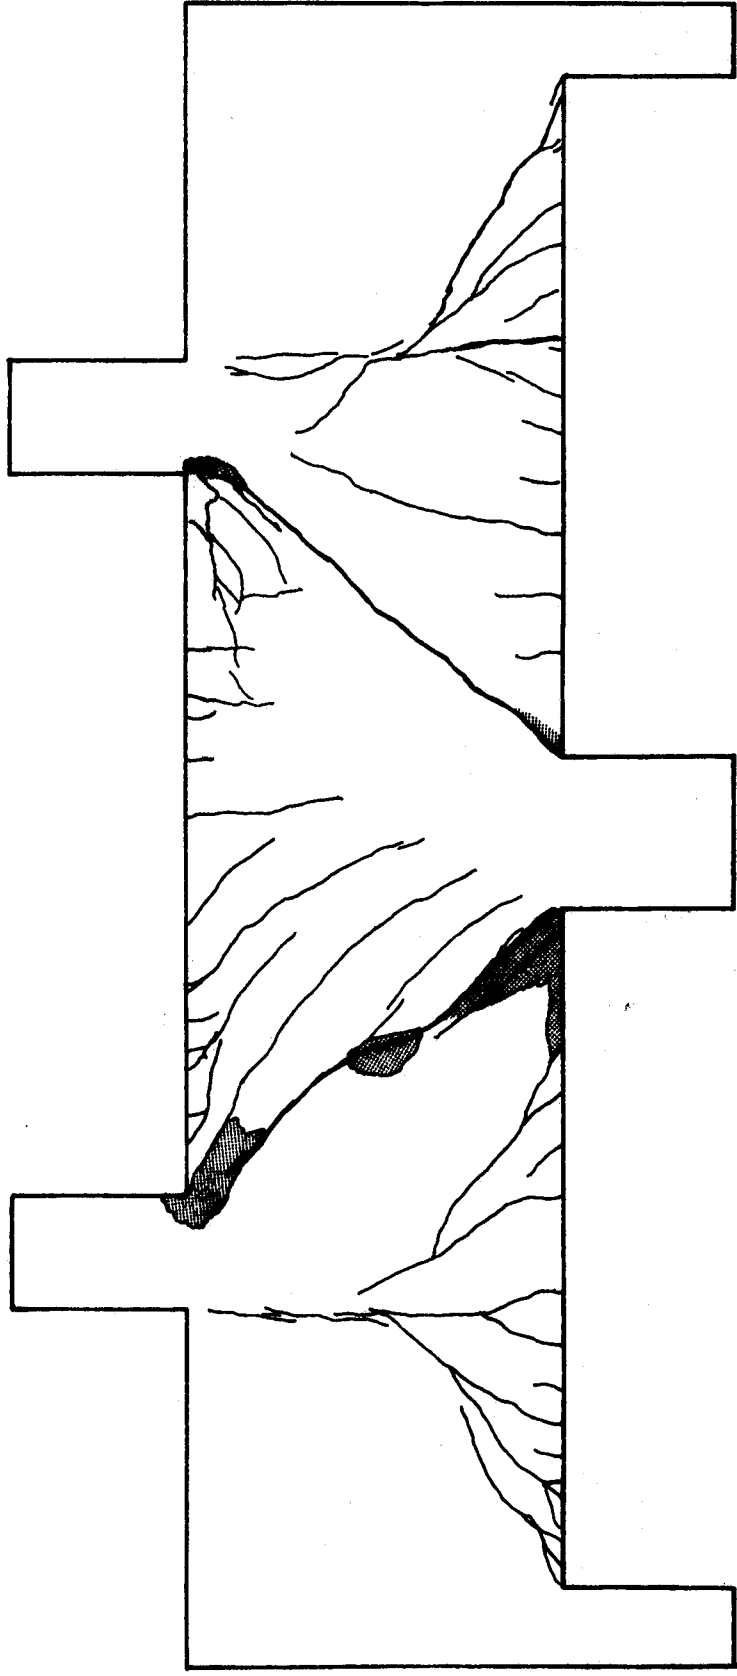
Beam 7/1.0 Crack Pattern - East Face (Reversed)
